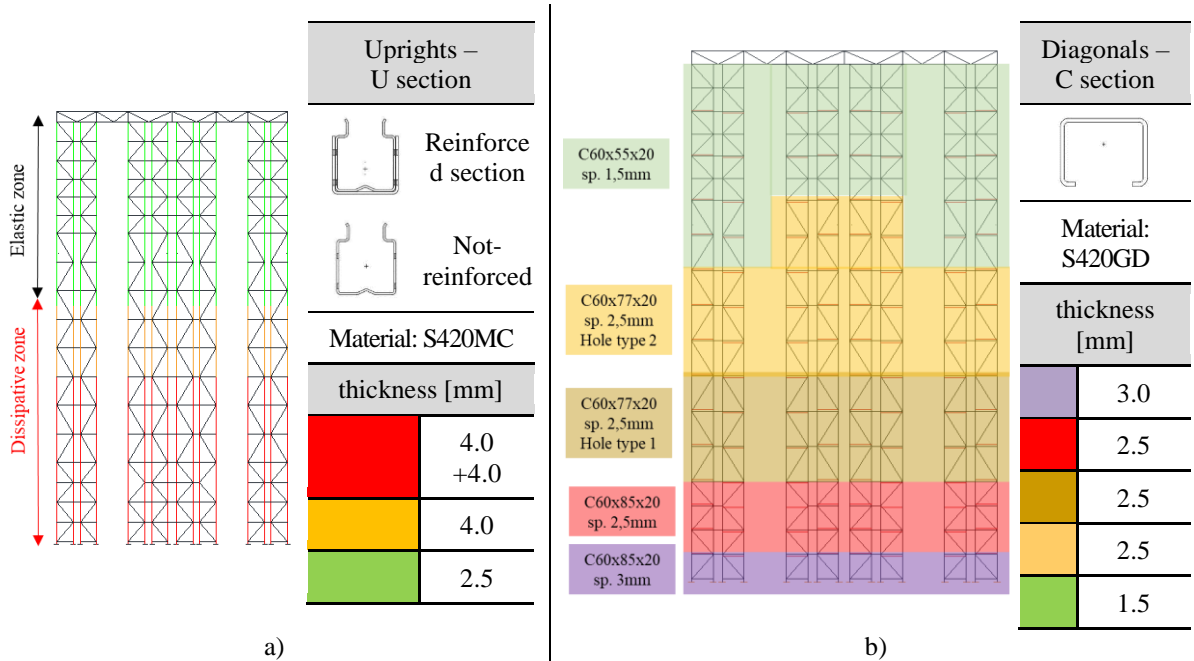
Application of the new strategy to the case study structure: a) frame view, where the dissipative zone and upright cross-sections are indicated; b) frame view, with cross-sections of diagonals indicated.
